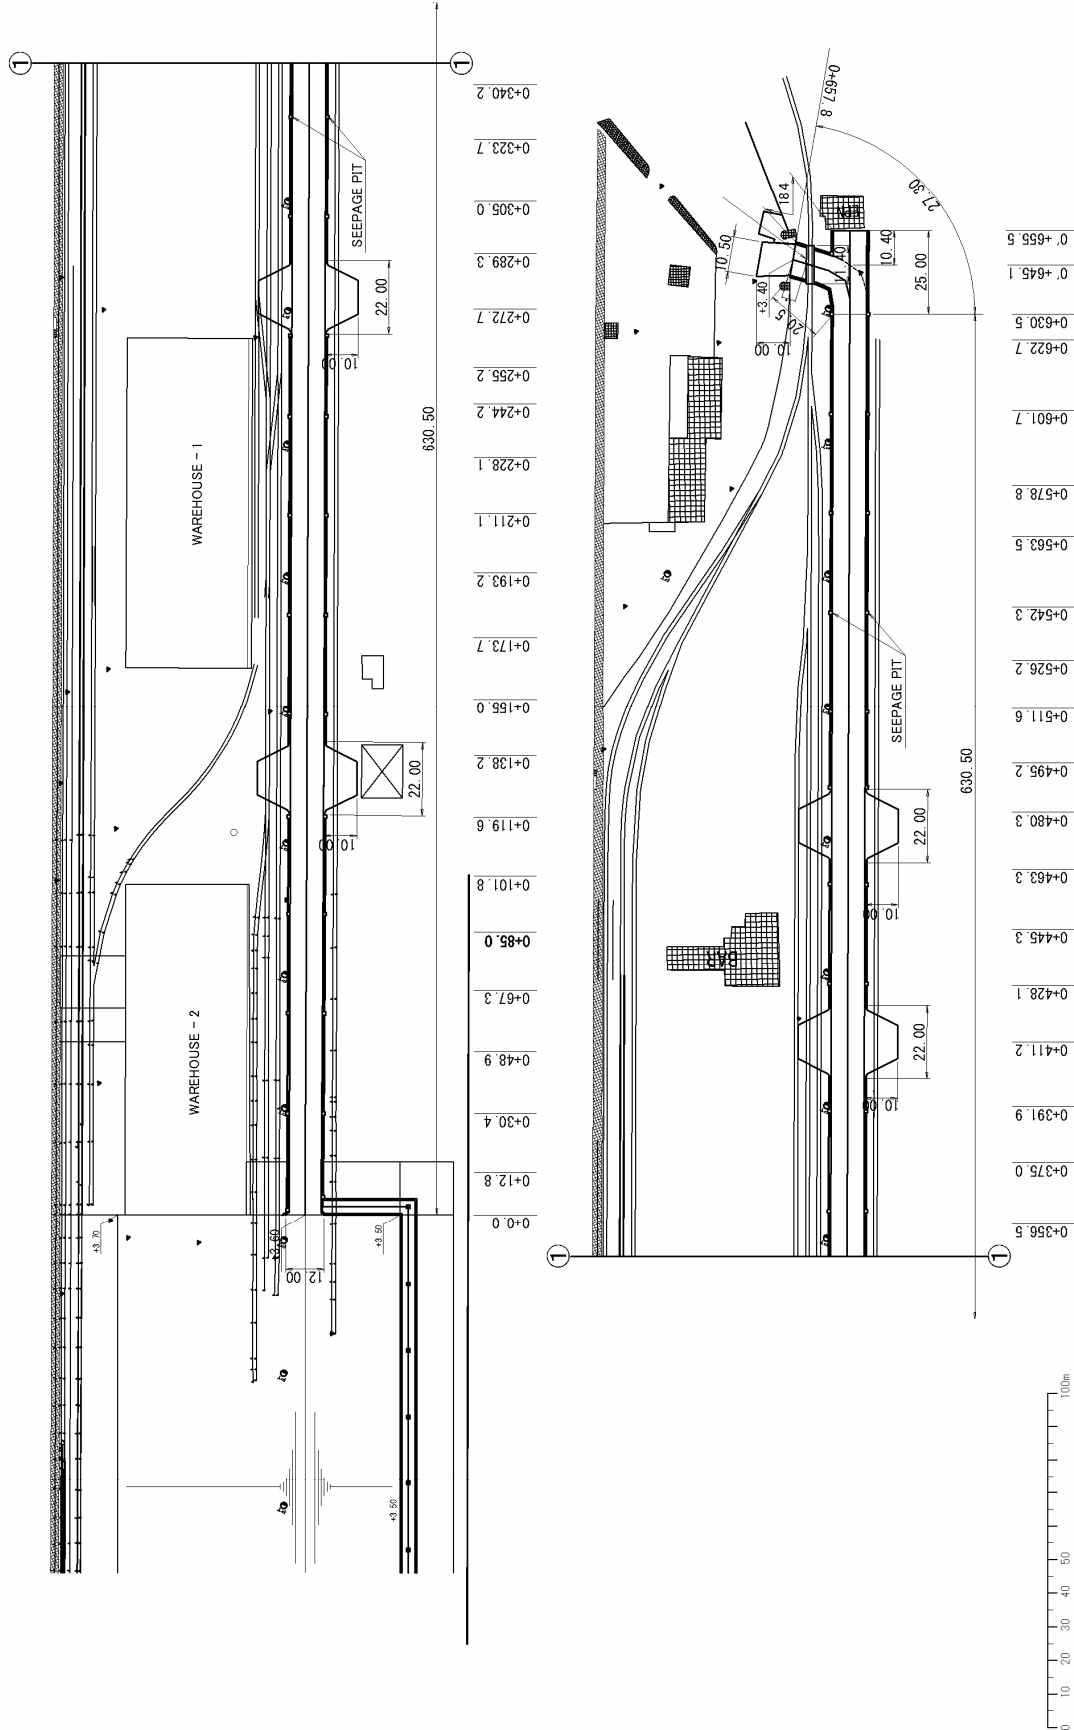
(27) Access Road Layout Plan in Port of Namibe
